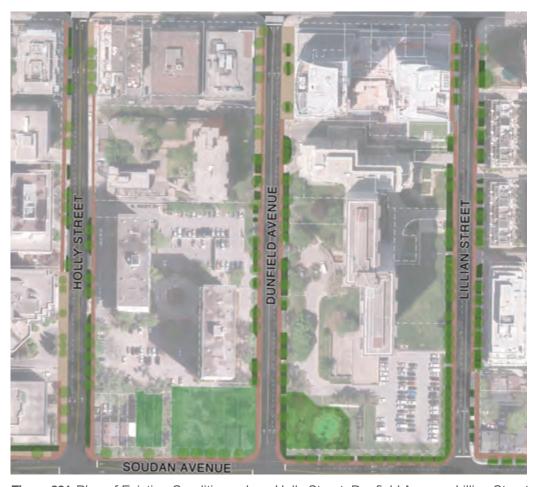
Plan of Existing Conditions along Holly Street, Dunfield Avenue, Lillian Street, and Brownlow Avenue
